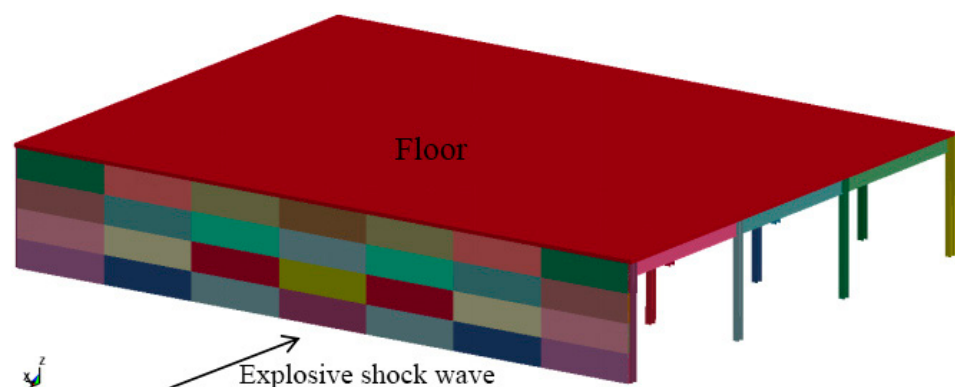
Petrochemical control structural model with 3D-Kagome sandwich blast-resistant wall.
